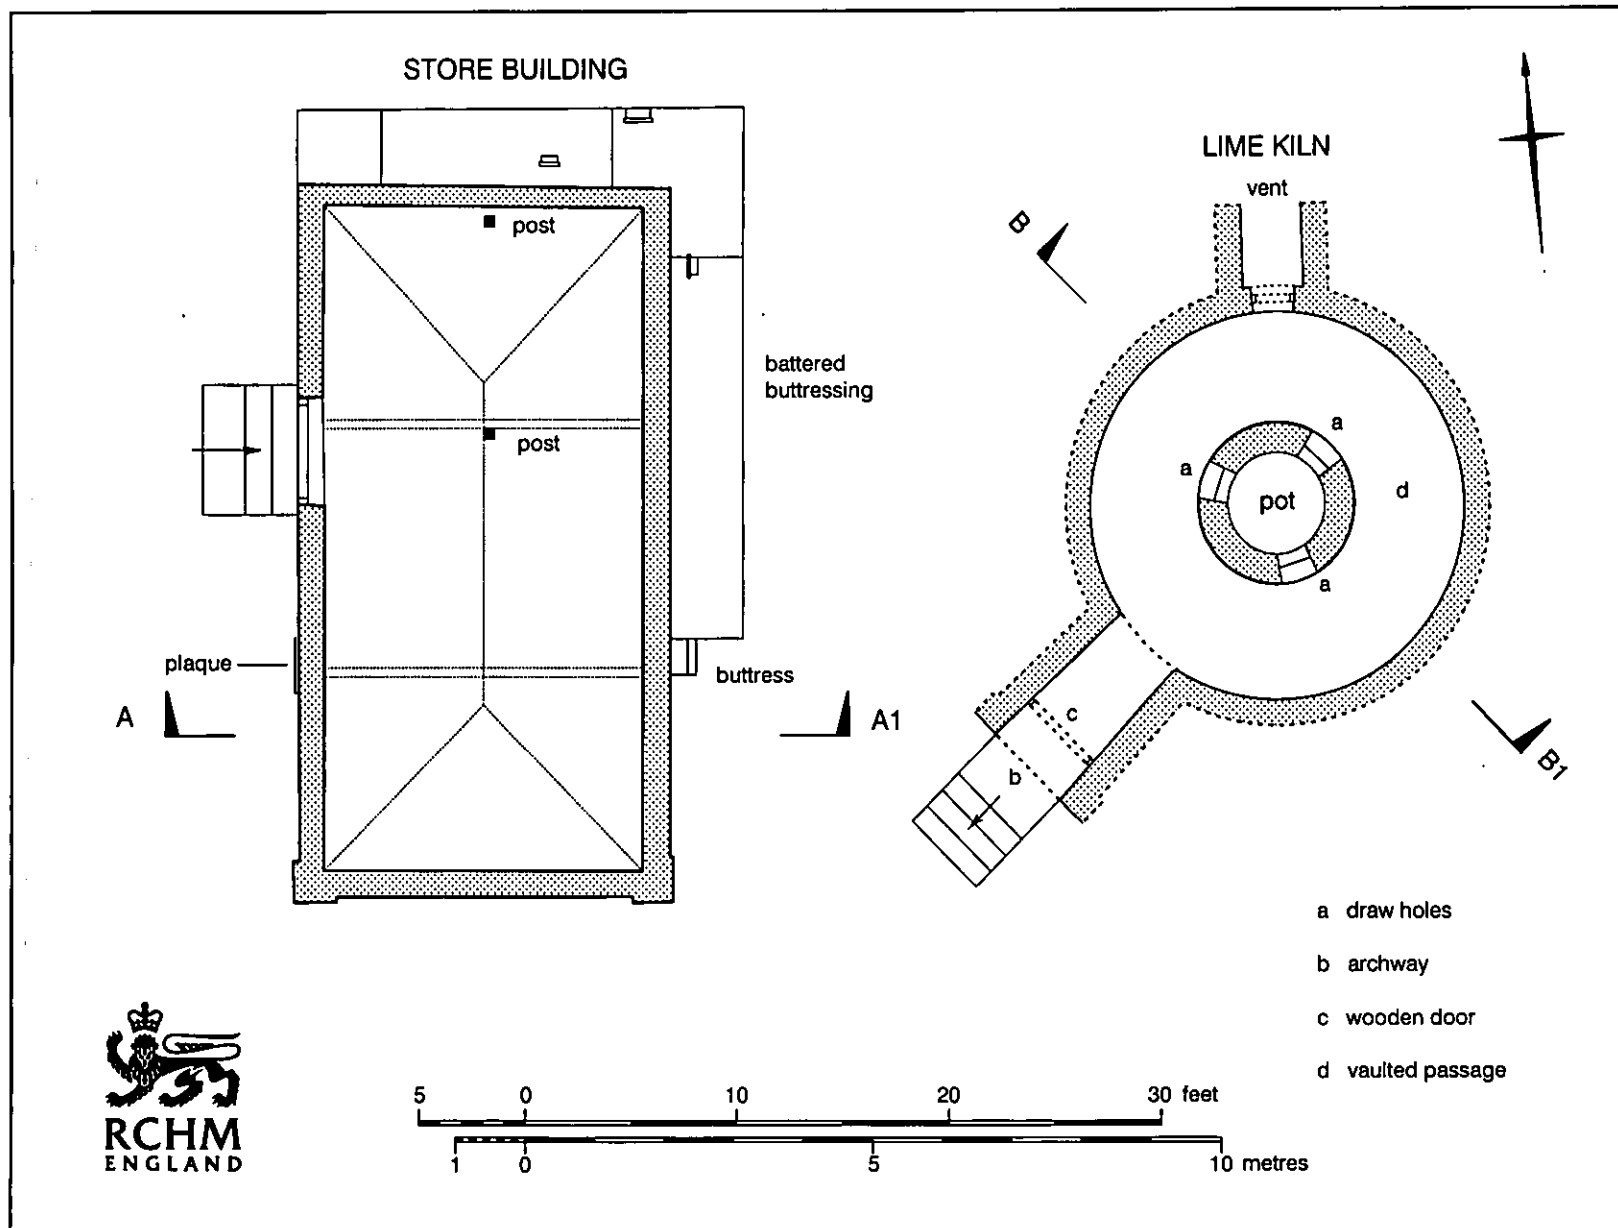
Beaumont Quay, RCHME plan of store building and limekiln
